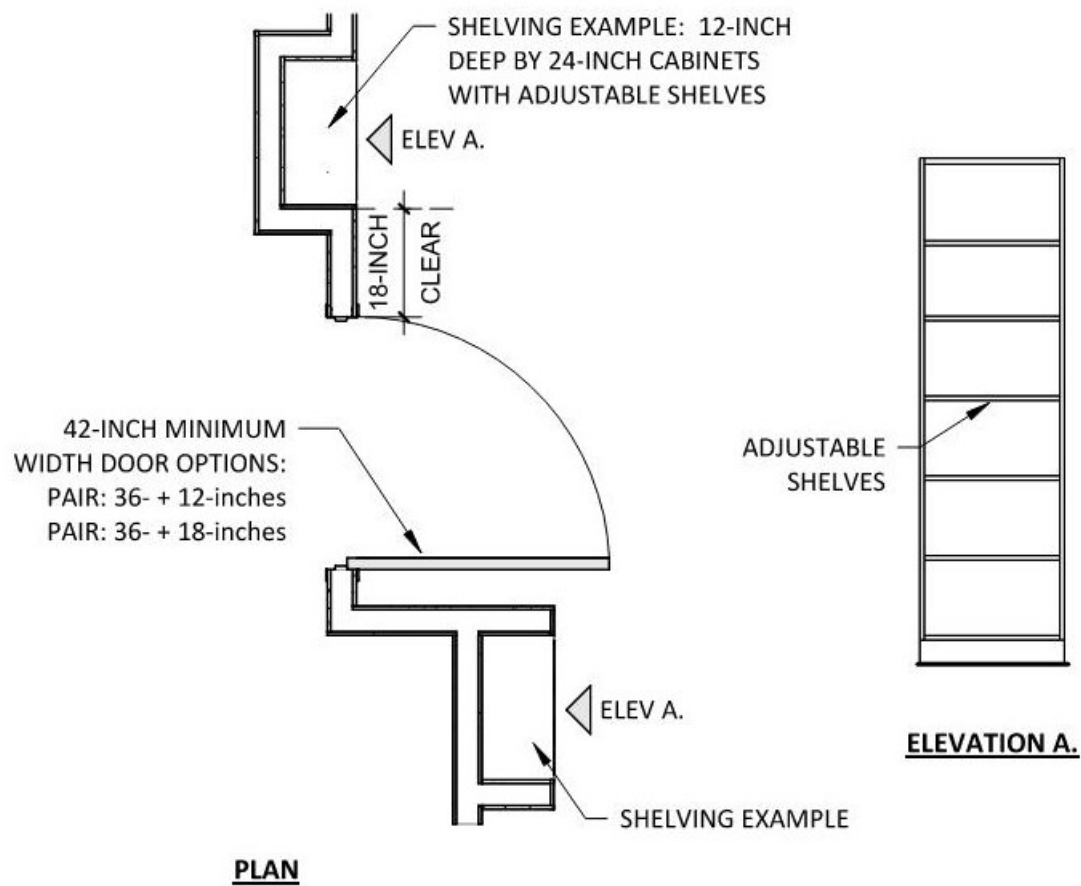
Laboratory Entry Storage – The drawing includes a partial floorplan of a door into a laboratory with surrounding walls and an elevation of a built-in shelves. The door into the lab is sized to be a minimum of forty-two inches wide. The door could be made with a single panel or pair of panels to achieve the minimum opening width.
